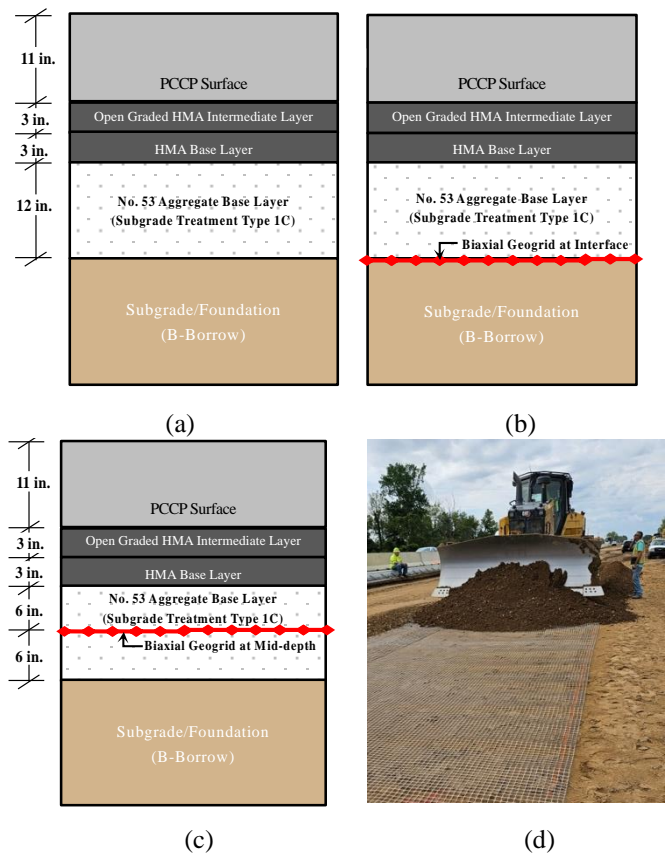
Pavement structures for (a) CS, (b) GG1, & (c) GG2. (1 in. = 25.4 mm) and (d) site construction with geogrid.
